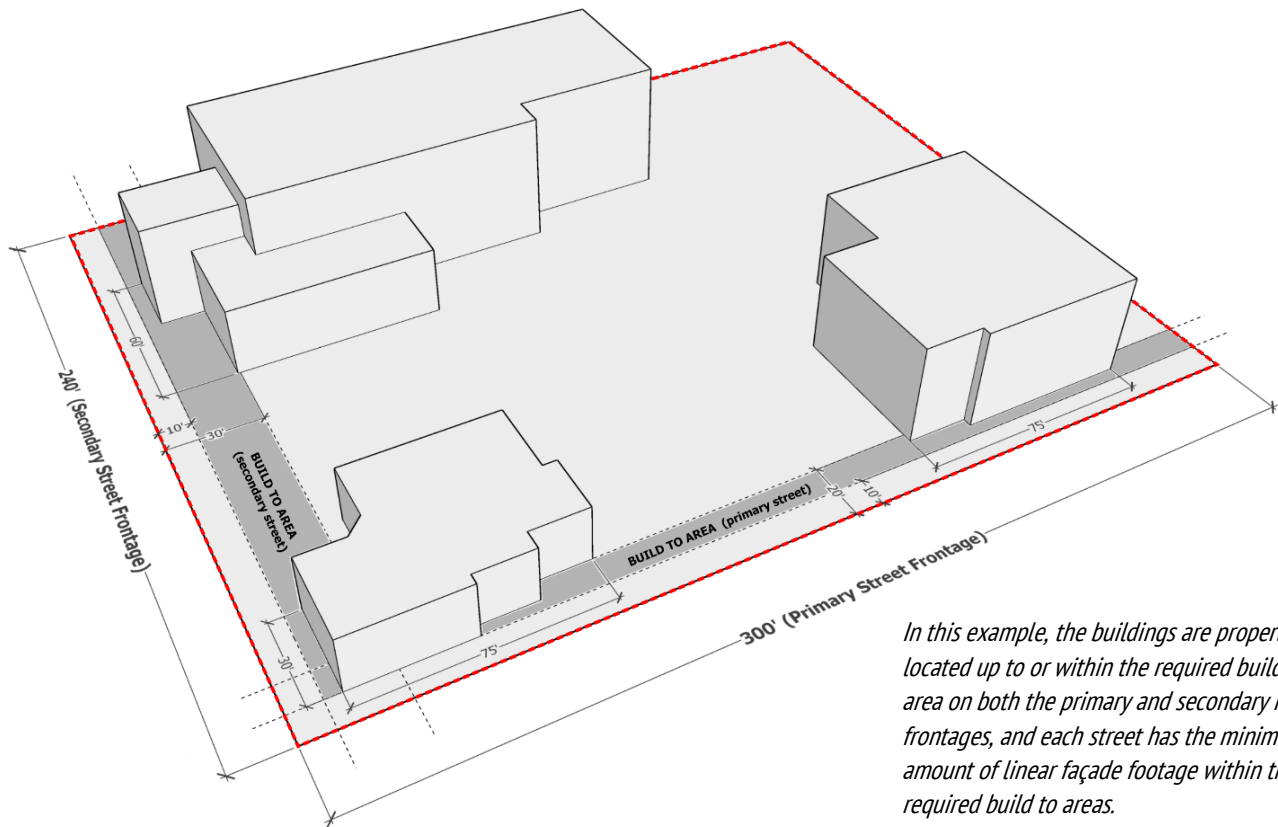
B: Illustration of build-to areas for an MUR zoned parcel with multiple buildings
